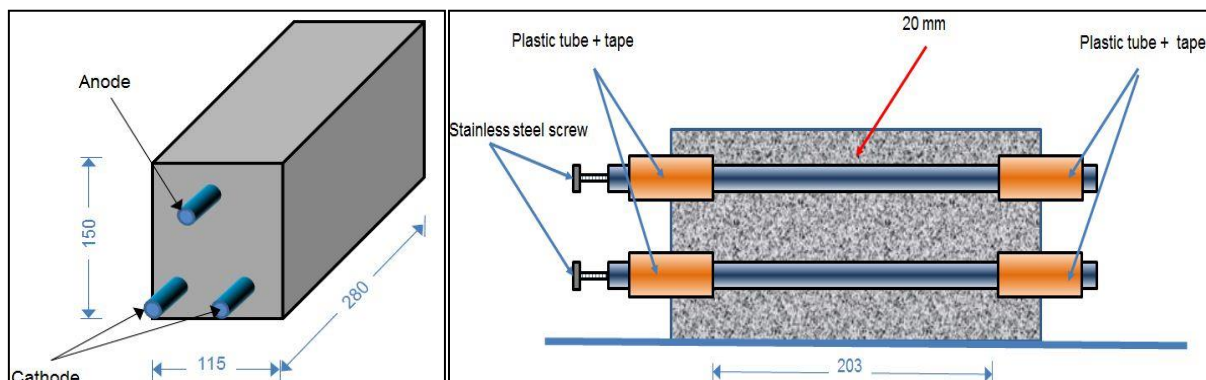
Sketch of the concrete beams according to ASTM G109 [6]
